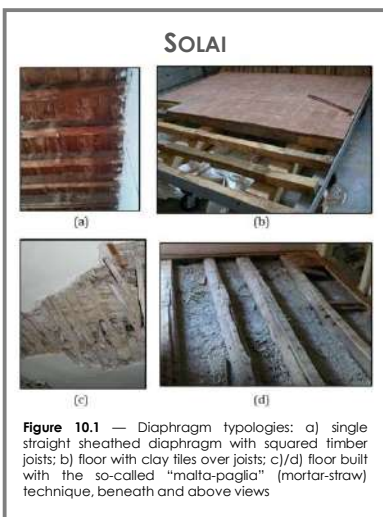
Diaphragm typologies: a) single straight sheathed diaphragm with squared timber joists; b) floor with clay tiles over joists; c) floor built with the so-called "malta-paglia" (mortar-straw) technique, beneath and above views
